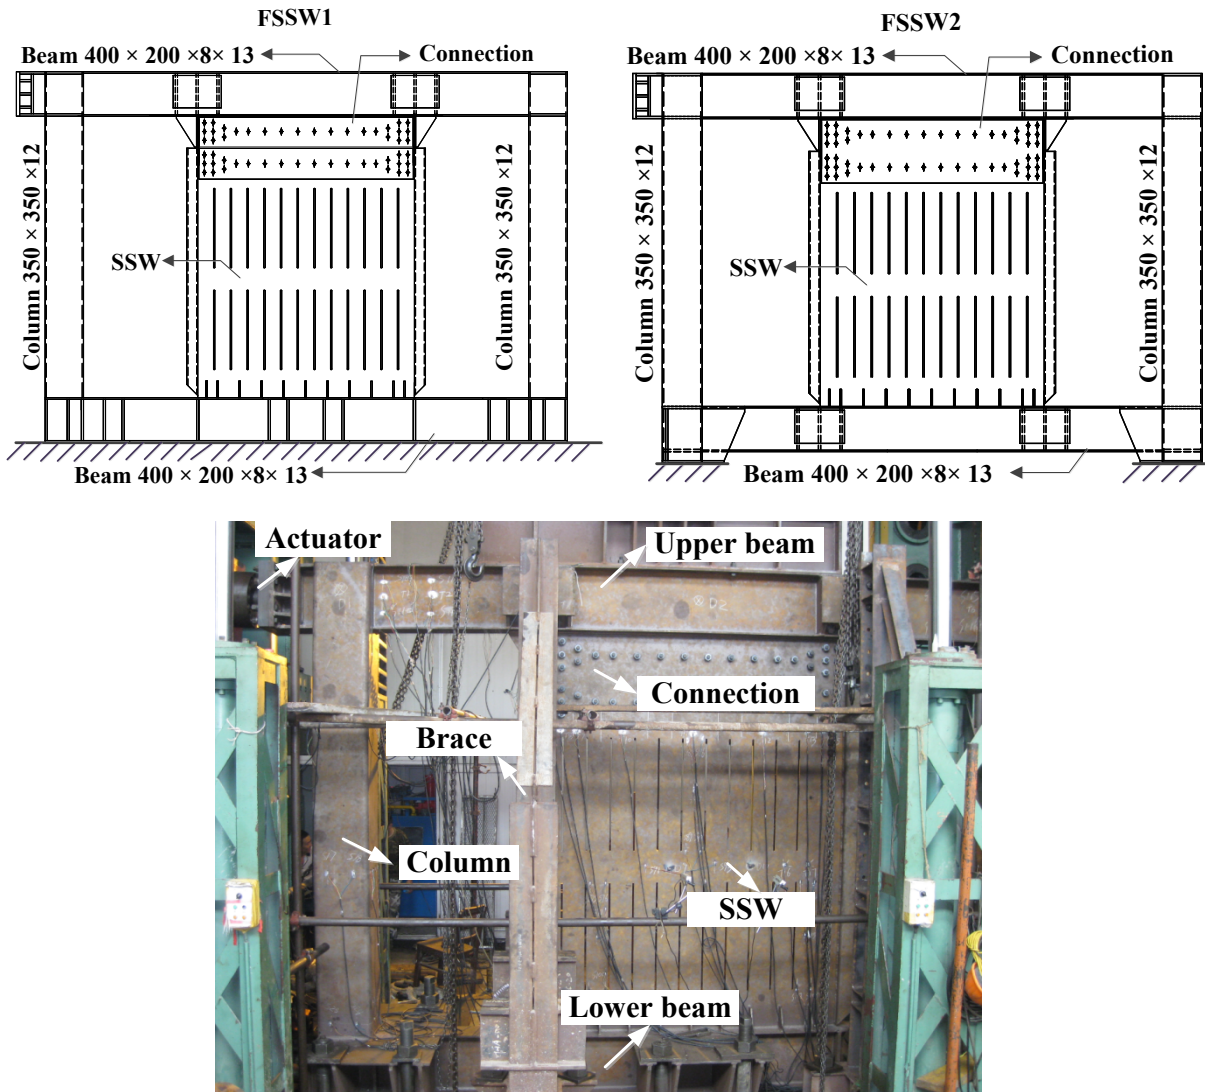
Specimens of steel MRFs equipped with SSWs [22].
